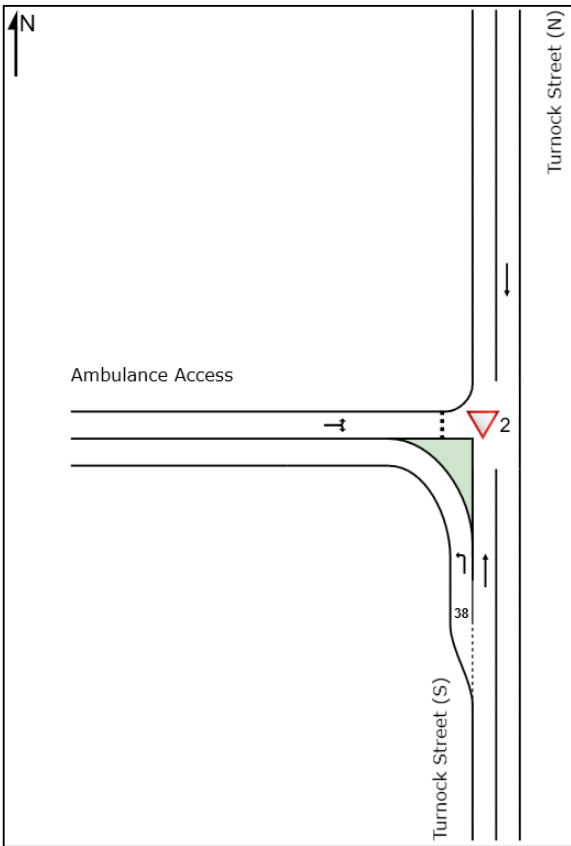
Turnock Street Driveway Access SIDRA Intersection Layout
